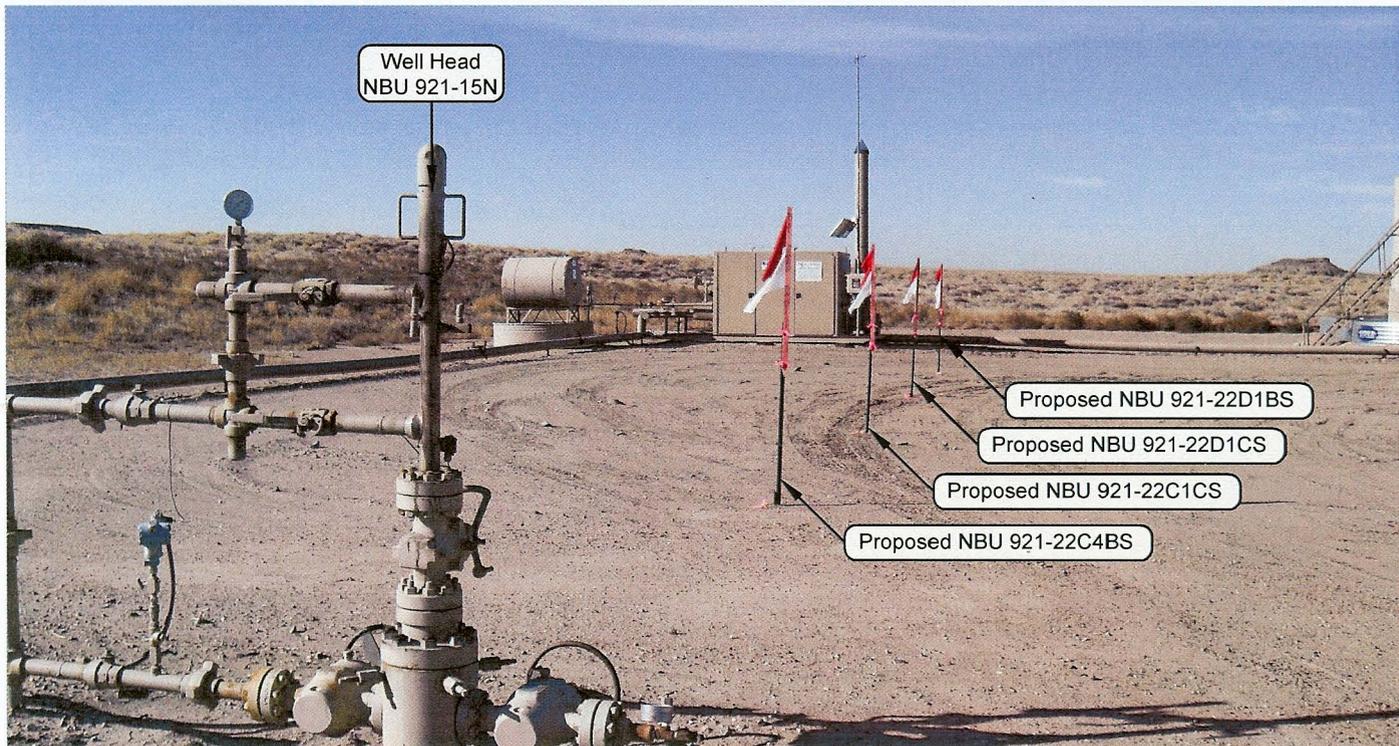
PHOTO VIEW: FROM EXISTING WELL HEAD TO LOCATION STAKES CAMERA ANGLE: SOUTHWESTERLY
